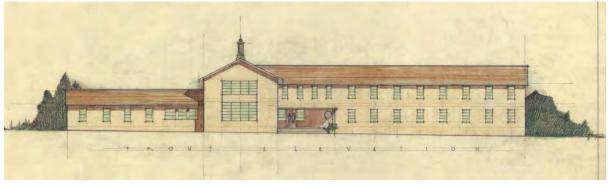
Proposed east façade of the new hostel accommodation by A. Hanson for the Department of Interior (NAA #7689904)
